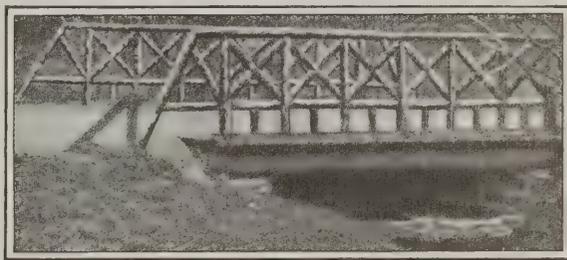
Rustic Bridge of Cedar with Diagonal Bracing
